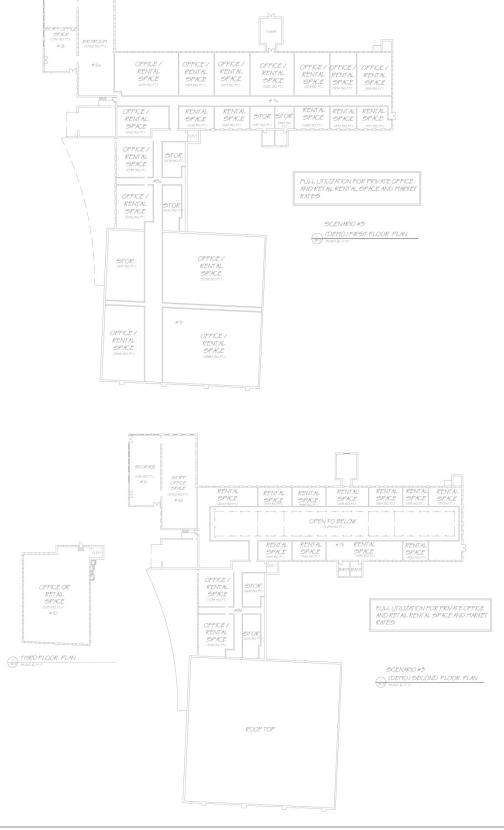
Retail and Office rental use - Option 3 Main and Second Floor Plan
